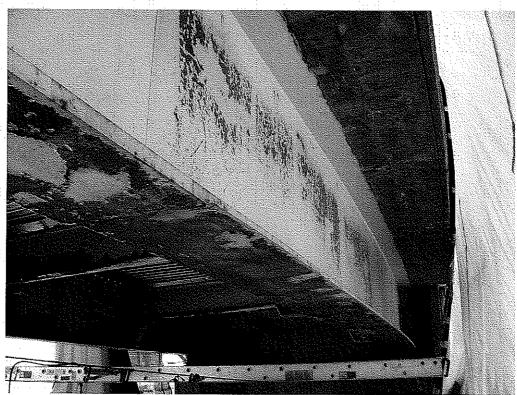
through 10 show California Avenue Bridge Span 3 prior to blast cleaning and painting.
